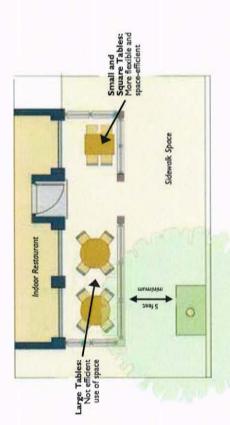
Efficient furniture layout – smaller furniture works better on King Street
